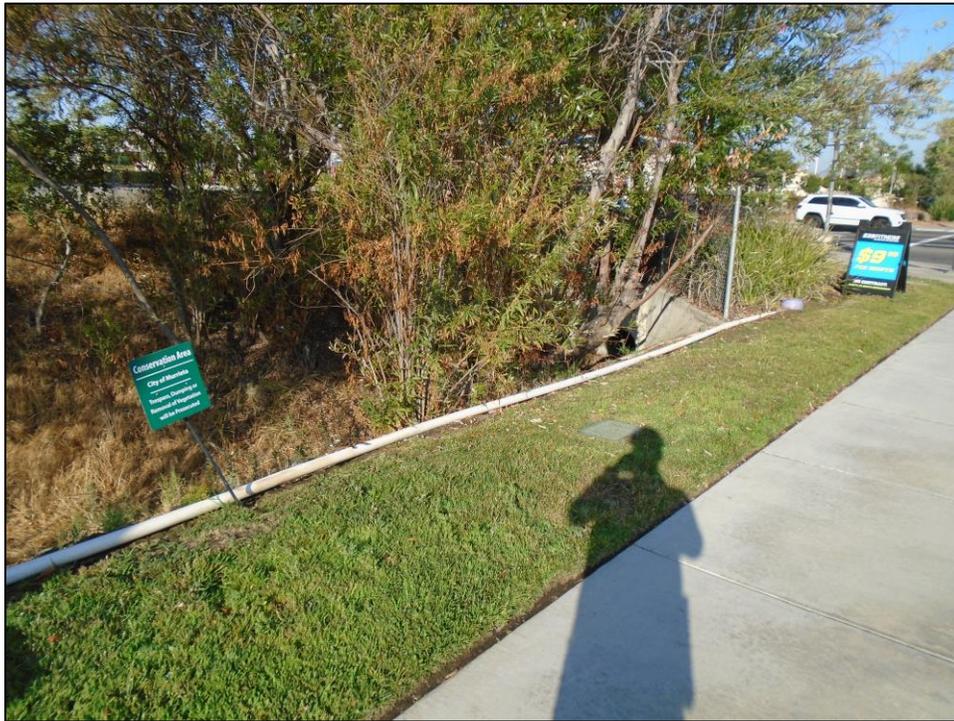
Earthen ditch, covered by vegetation and terminating under Margarita Road in a cement culvert. View southwest.
